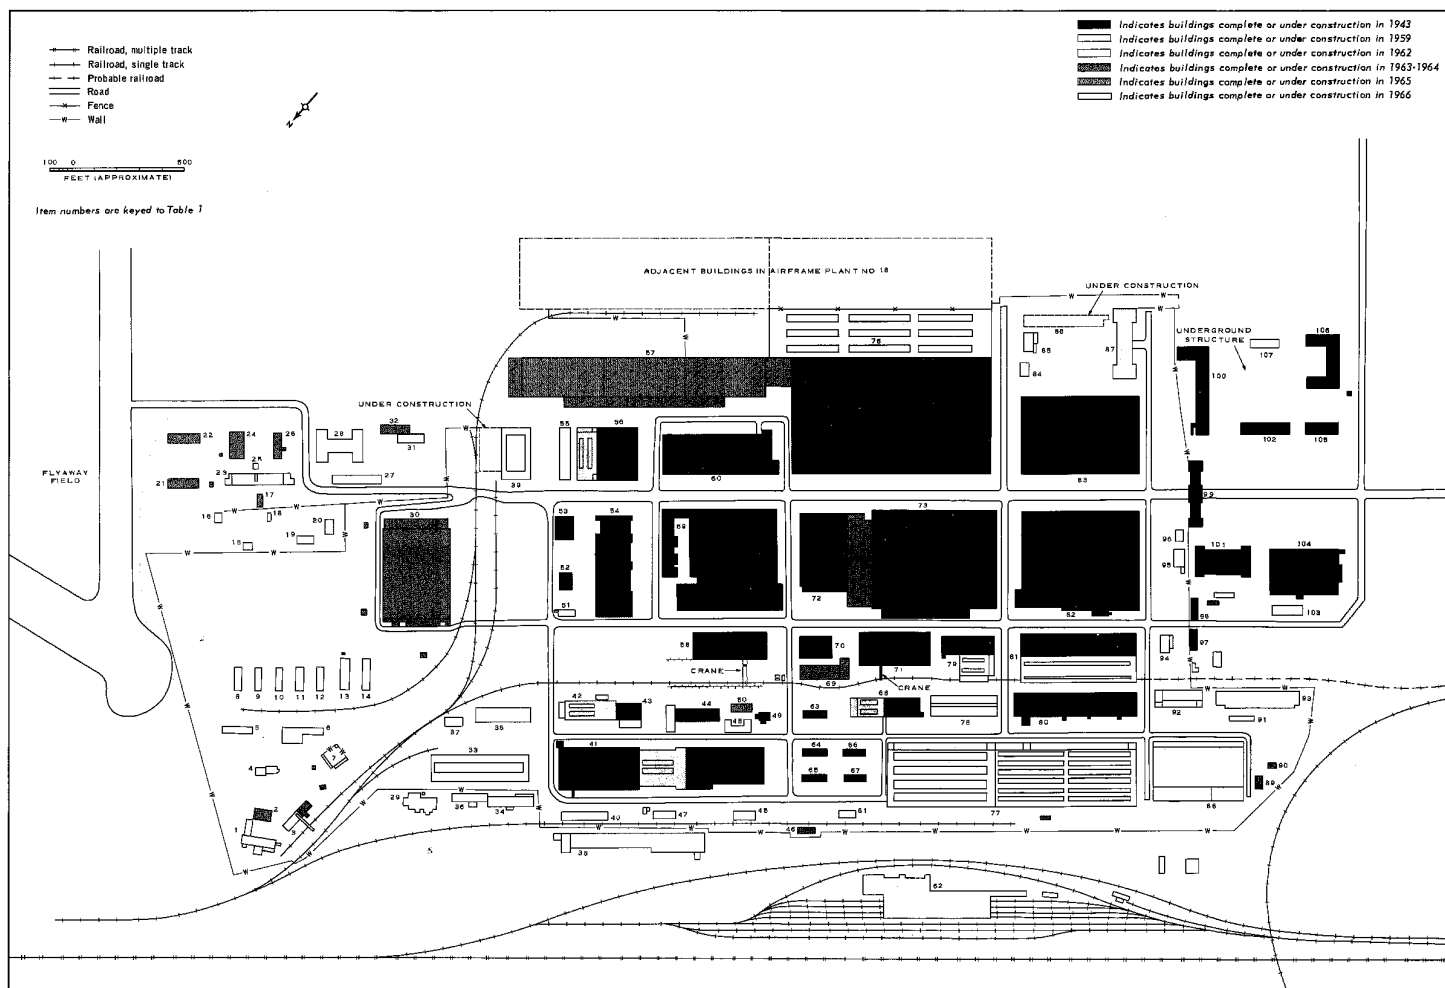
LAYOUT OF AIRFRAME PLANT NO 1.
